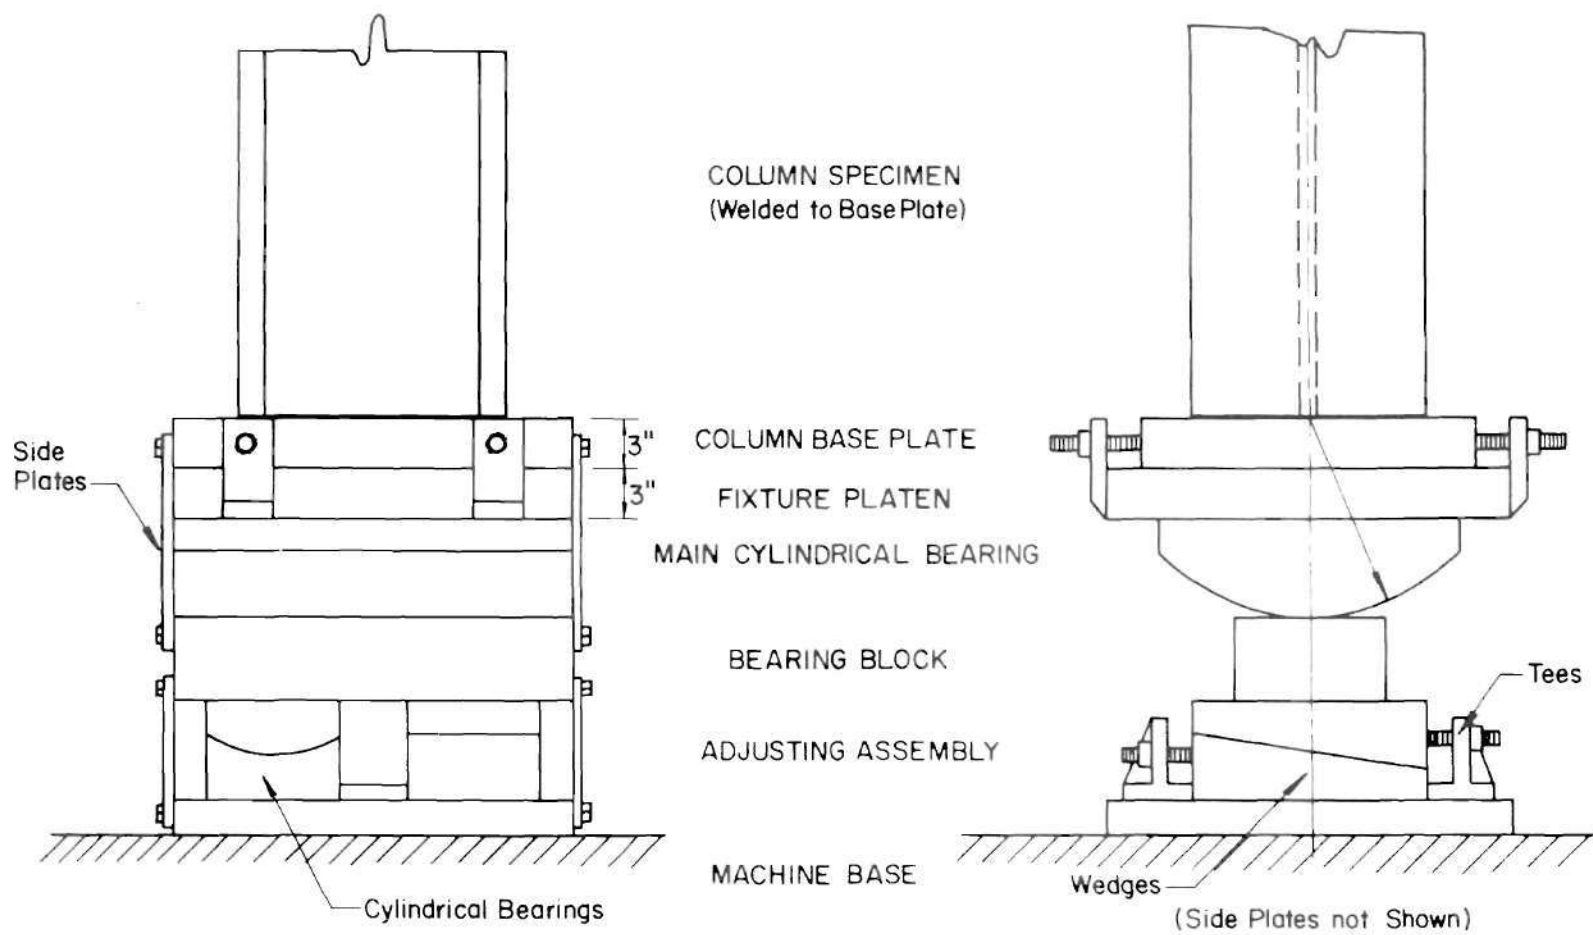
Standard Column End Fixture at Fritz Engineering Laboratory.
